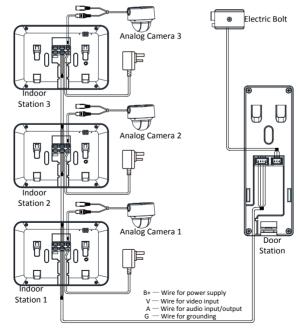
Wiring 2 (1 Door Station and 3 Indoor Stations)
